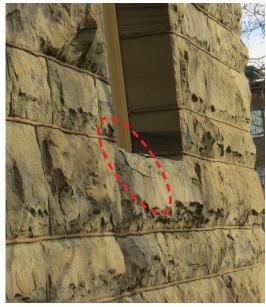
Cracked Stone at South Elevation Window Sill (circled in red)
